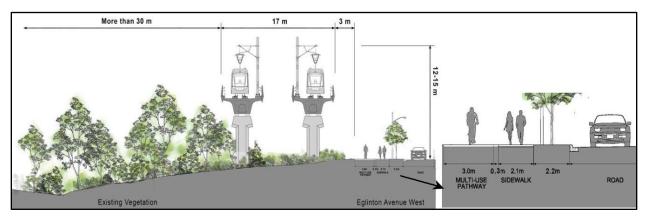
Elevated Guideway Double-Pier Configuration (East of Jane Street)
